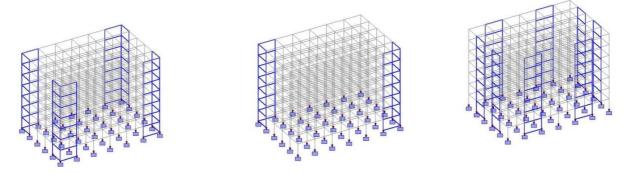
,5,6 - Model of G+6 building without a shear wall – M3, M4, M5
